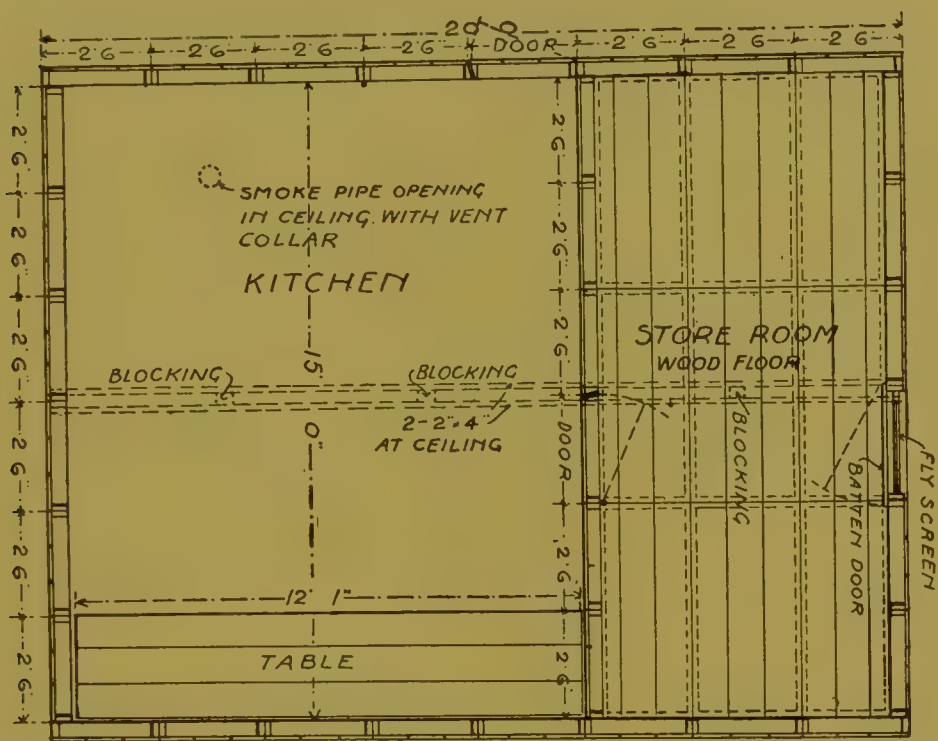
Floor plan of field kitchen. Knock-down system.
